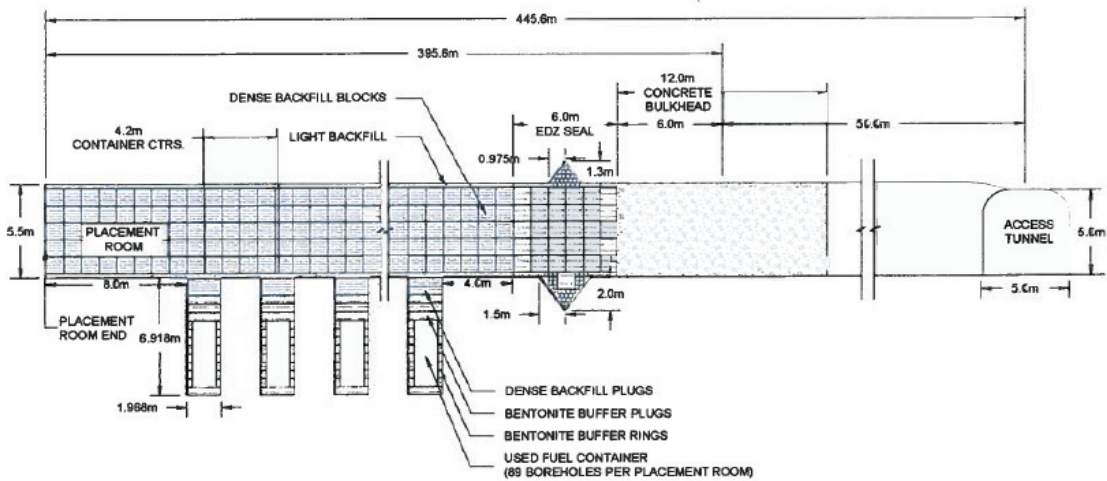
Longitudinal cross section of a typical placement tunnel in the CANDU DGR (SNC-Lavalin, 2011)
